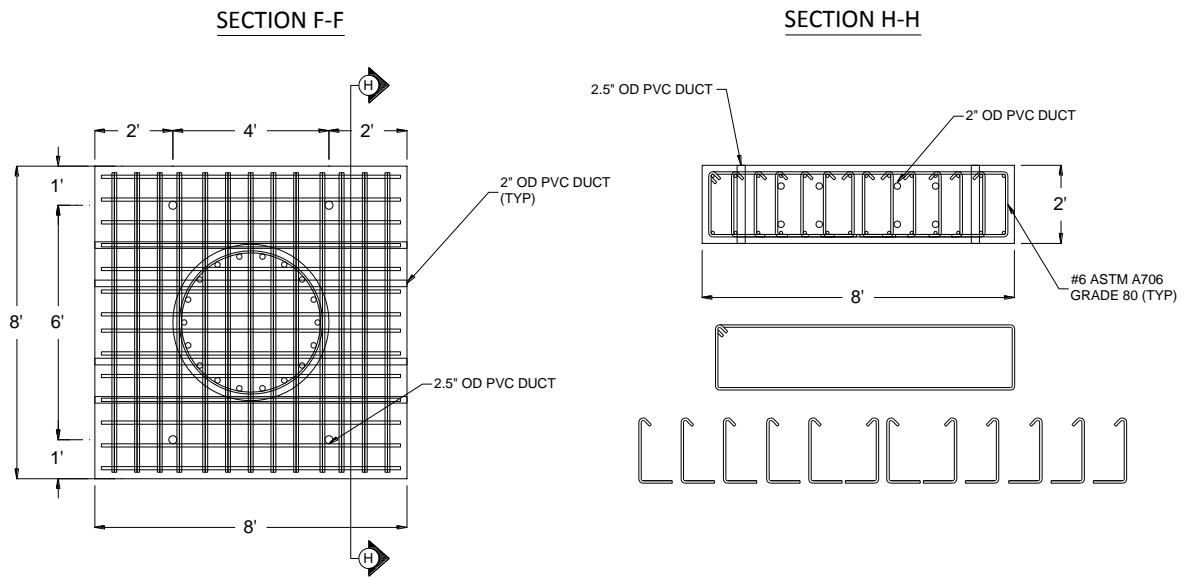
Cross section of hammerhead (Lotfizadeh, 2019).
